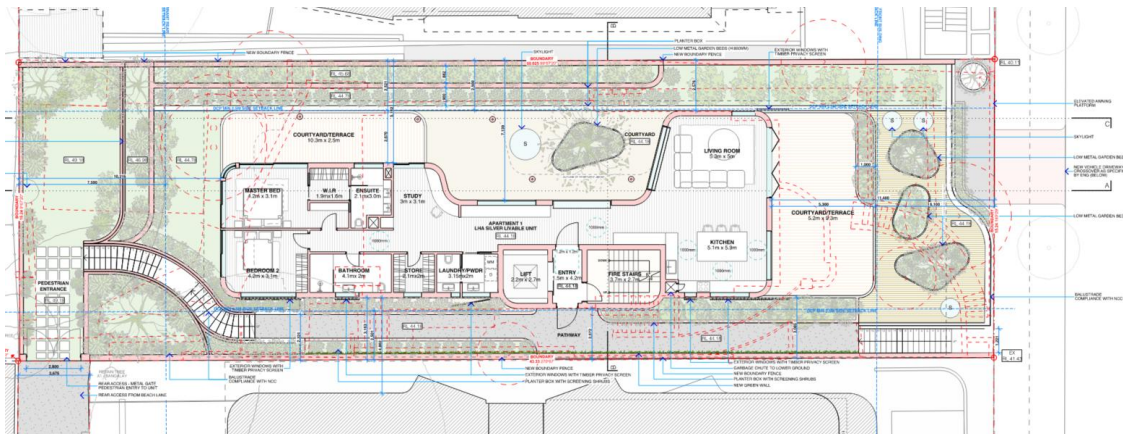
Ground floor plan as amended (Source: Roth Architects)
